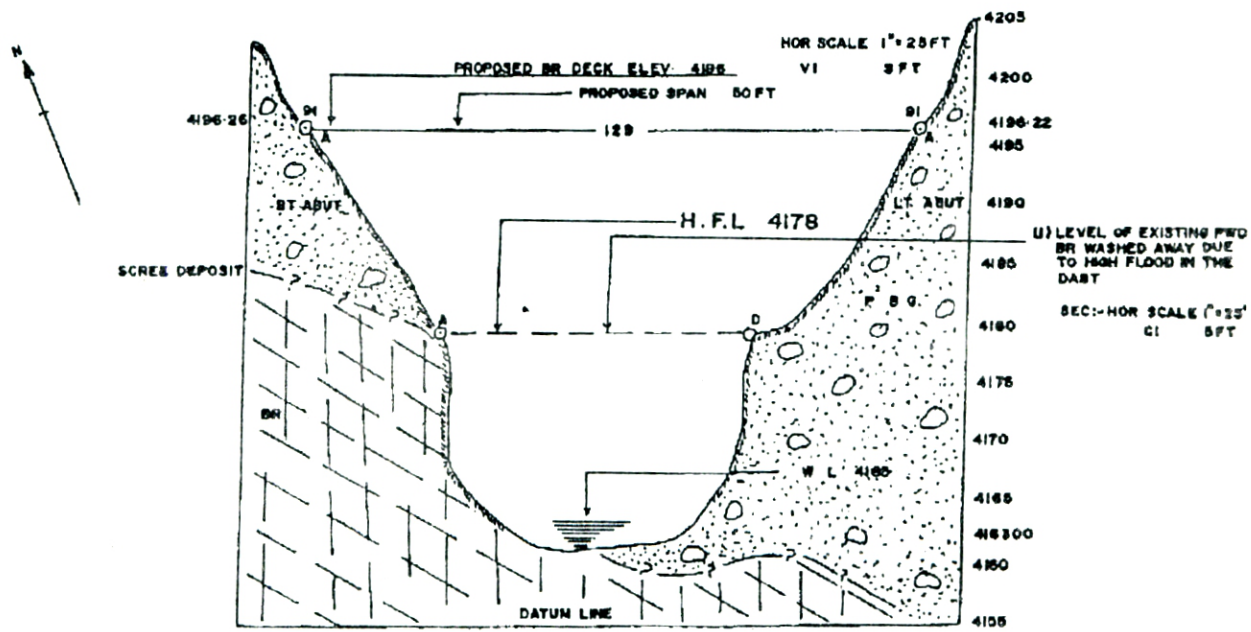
Geologic cross section at the proposed Keksho Nullah bridge.
